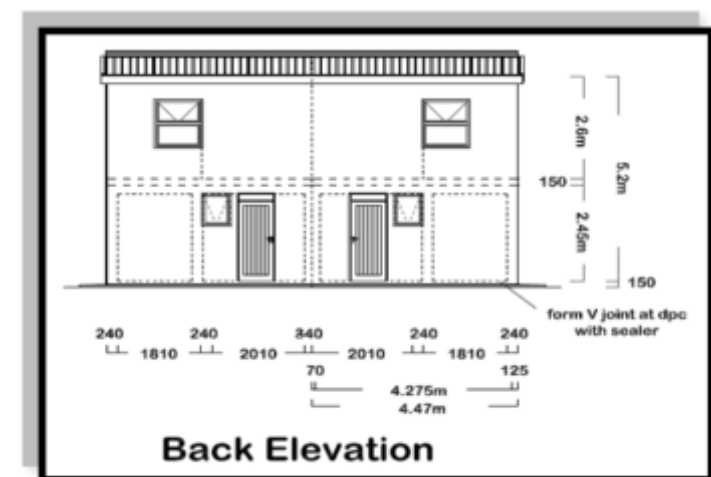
TYPOLOGY C - BACK ELEVATION
